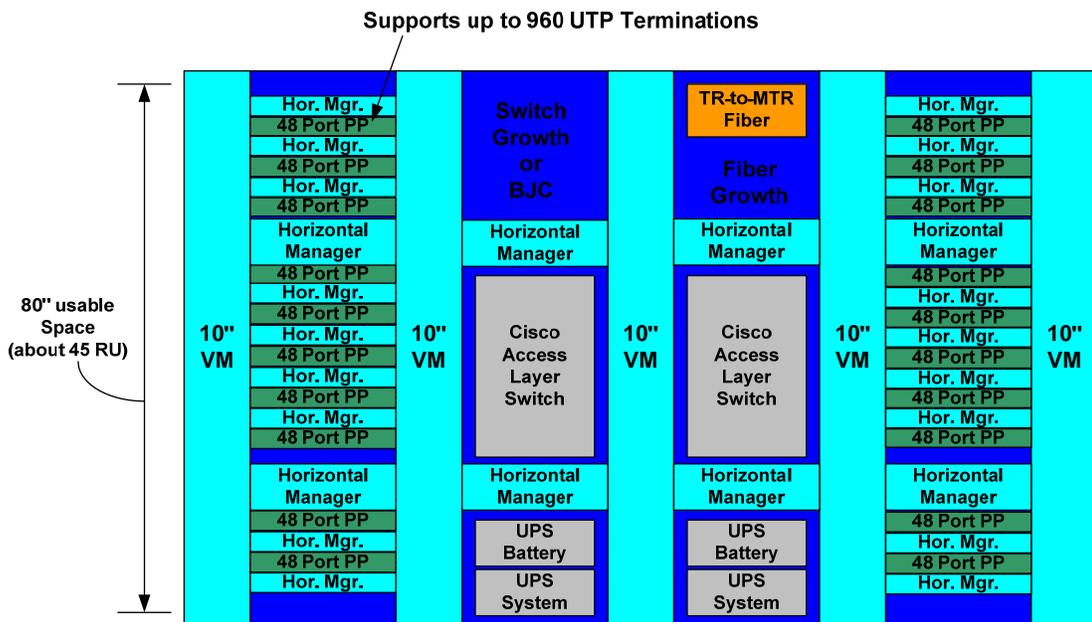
Building Low Voltage - Telecommunications Room Standard Size and Rack Layout
